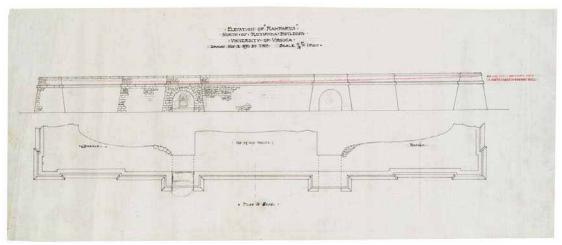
The elevation drawing of the ramparts provides detail of the stone passageways and interior walls in 1896. Courtesy The New-York Historical Society. (R-JAV-NYHS-MMW-1896-11-12-87779d_UVARamparts_MMW-M-2-ramparts complete plan.JPG)
